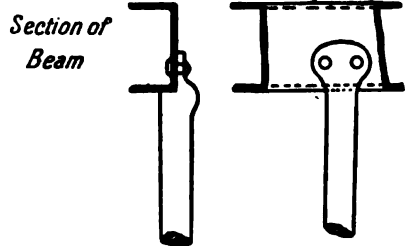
Connection of Pillar Head to Channel Bar Beam.
